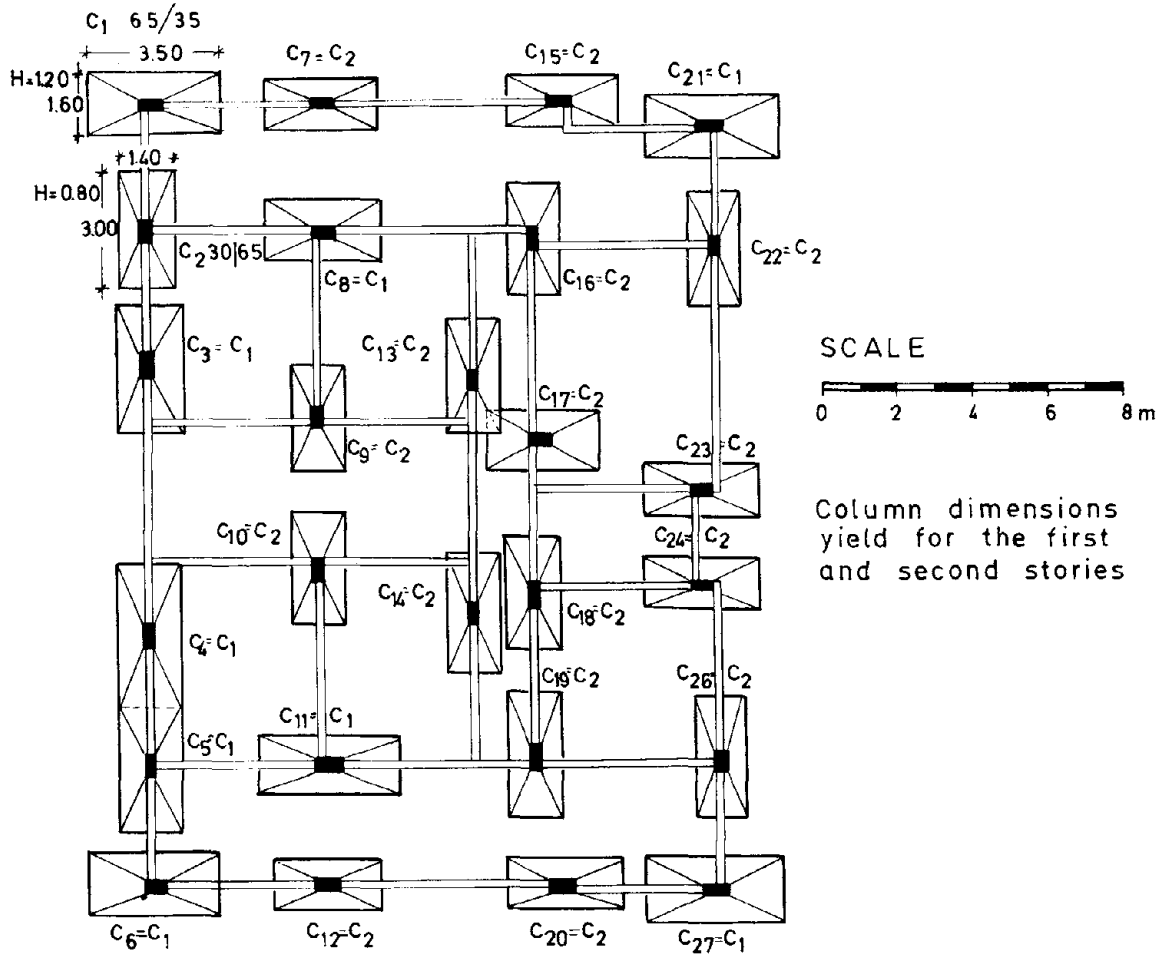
Block of Flats Segas in Loutraki. Foundation framing plan.
